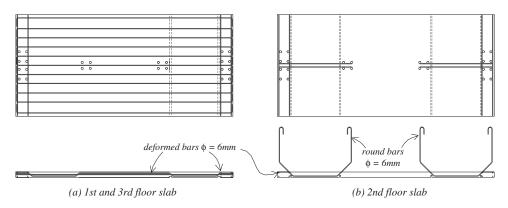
Plan and front view of slab showing additional reinforcement.
